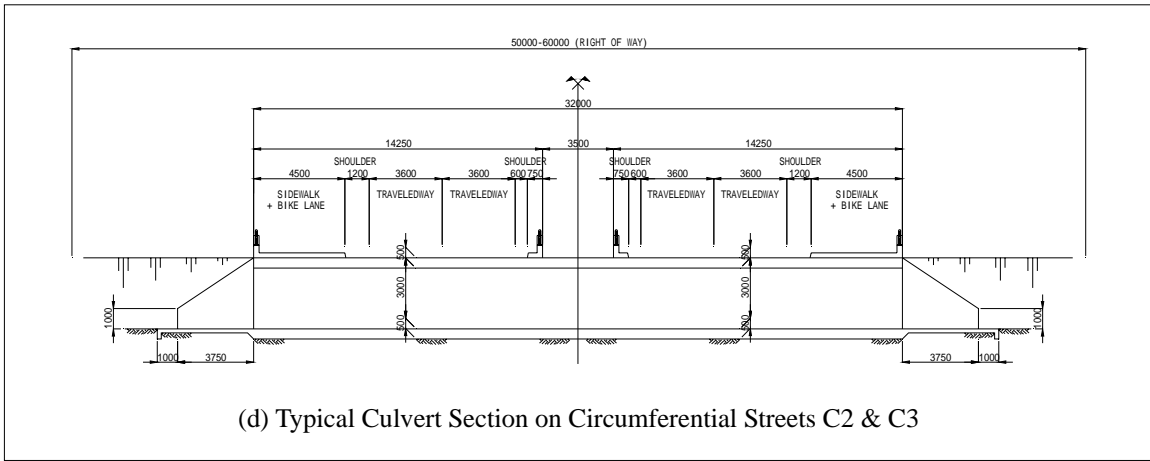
(2) Typical Cross-Sections of Culverts on Circumferential Streets
